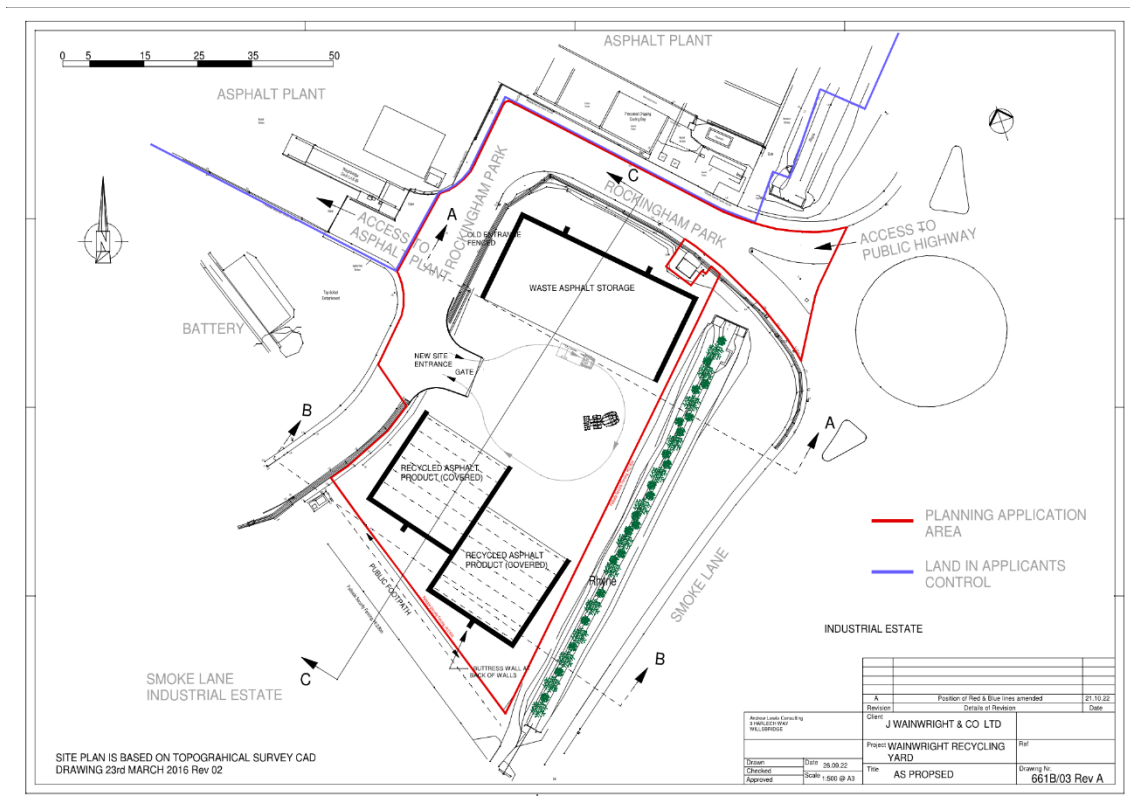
Proposed Site Layout (image courtesy of J Wainwright & Co Ltd)
